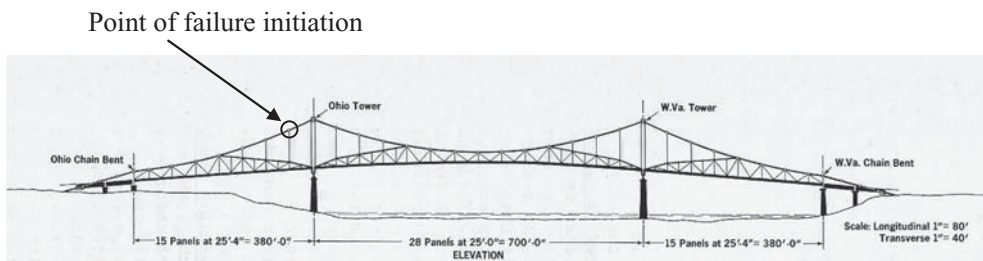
Sketch of the Point Pleasant Bridge (from NTSB 1970).
